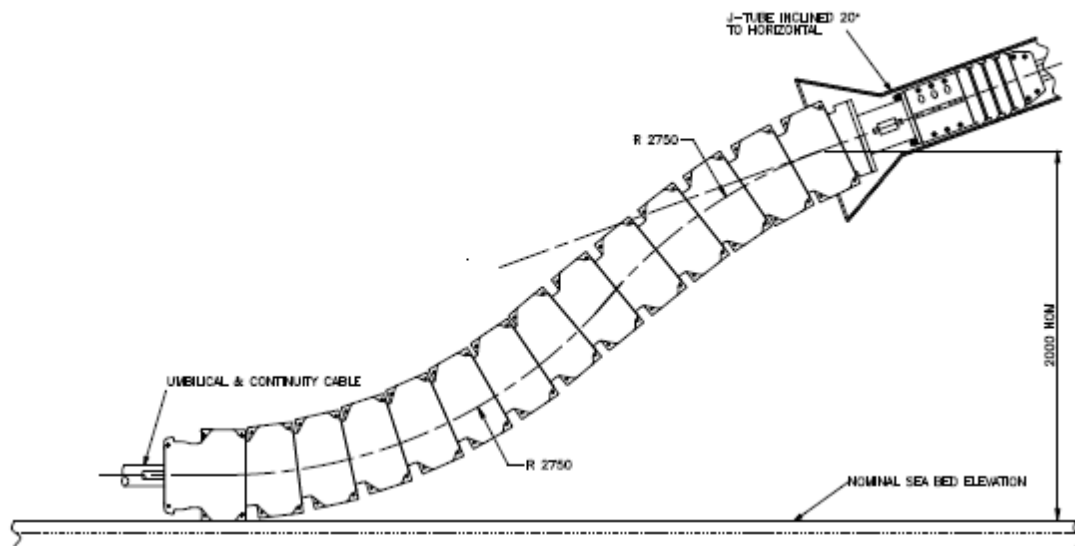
Typical J-Tube Seal & Bend Limiter Configuration.
